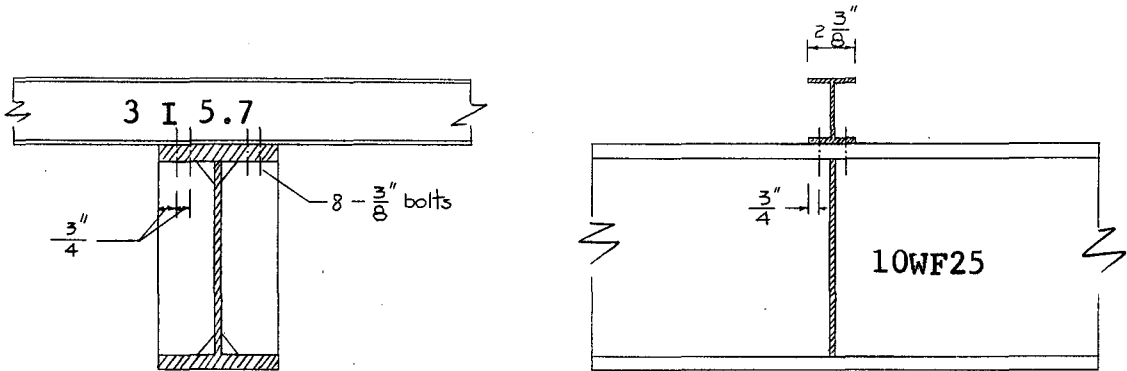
LB-25 Continuous purlins bolted to the compression flange of beam.
